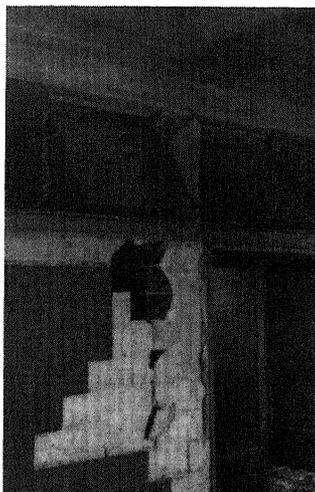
SHORT COLUMNS IN SCHOOL BUILDING
